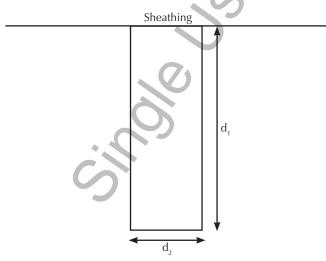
Cross-Sectional In-Plane and Out-of-Plane Dimensions.
